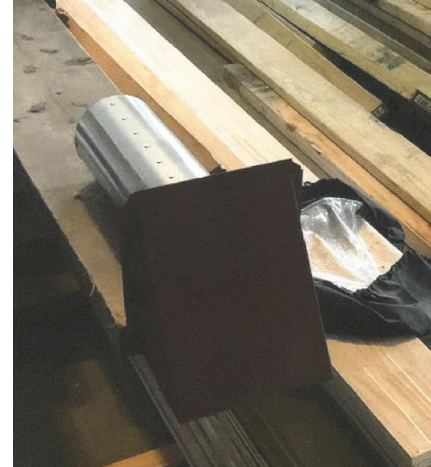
A photo of the proposed vent caps that was submitted by the applicant.
